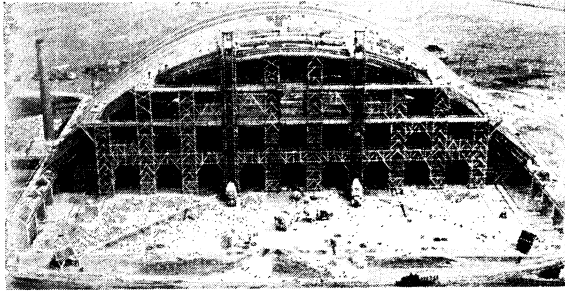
Another method of lifting concrete. Hoisting towers are integral part of centering; towers with "added booms" are used to hoist reinforcing steel.
